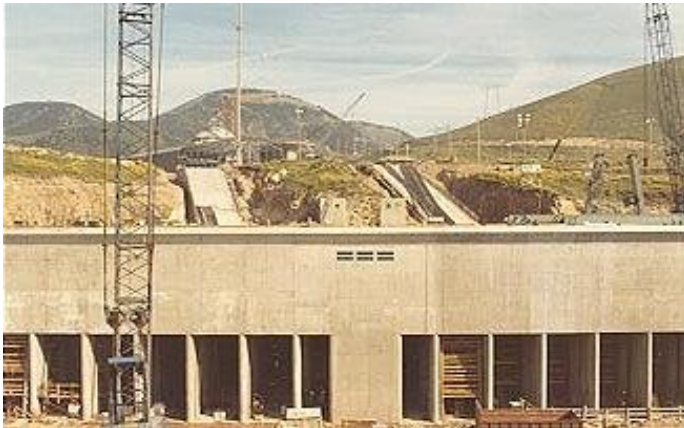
Undated photo of Intake Structure under construction, looking northeast. The openings are the intake gates that are now submerged. The six vents in the center is visible above the waterline. Source: PG&E.
